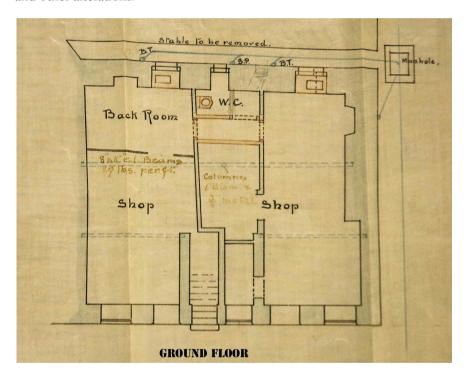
Thirteen Canongate. Ground Floor. Dean of Guild Plans, 8 April 1893. Edinburgh Municipal Archives.
